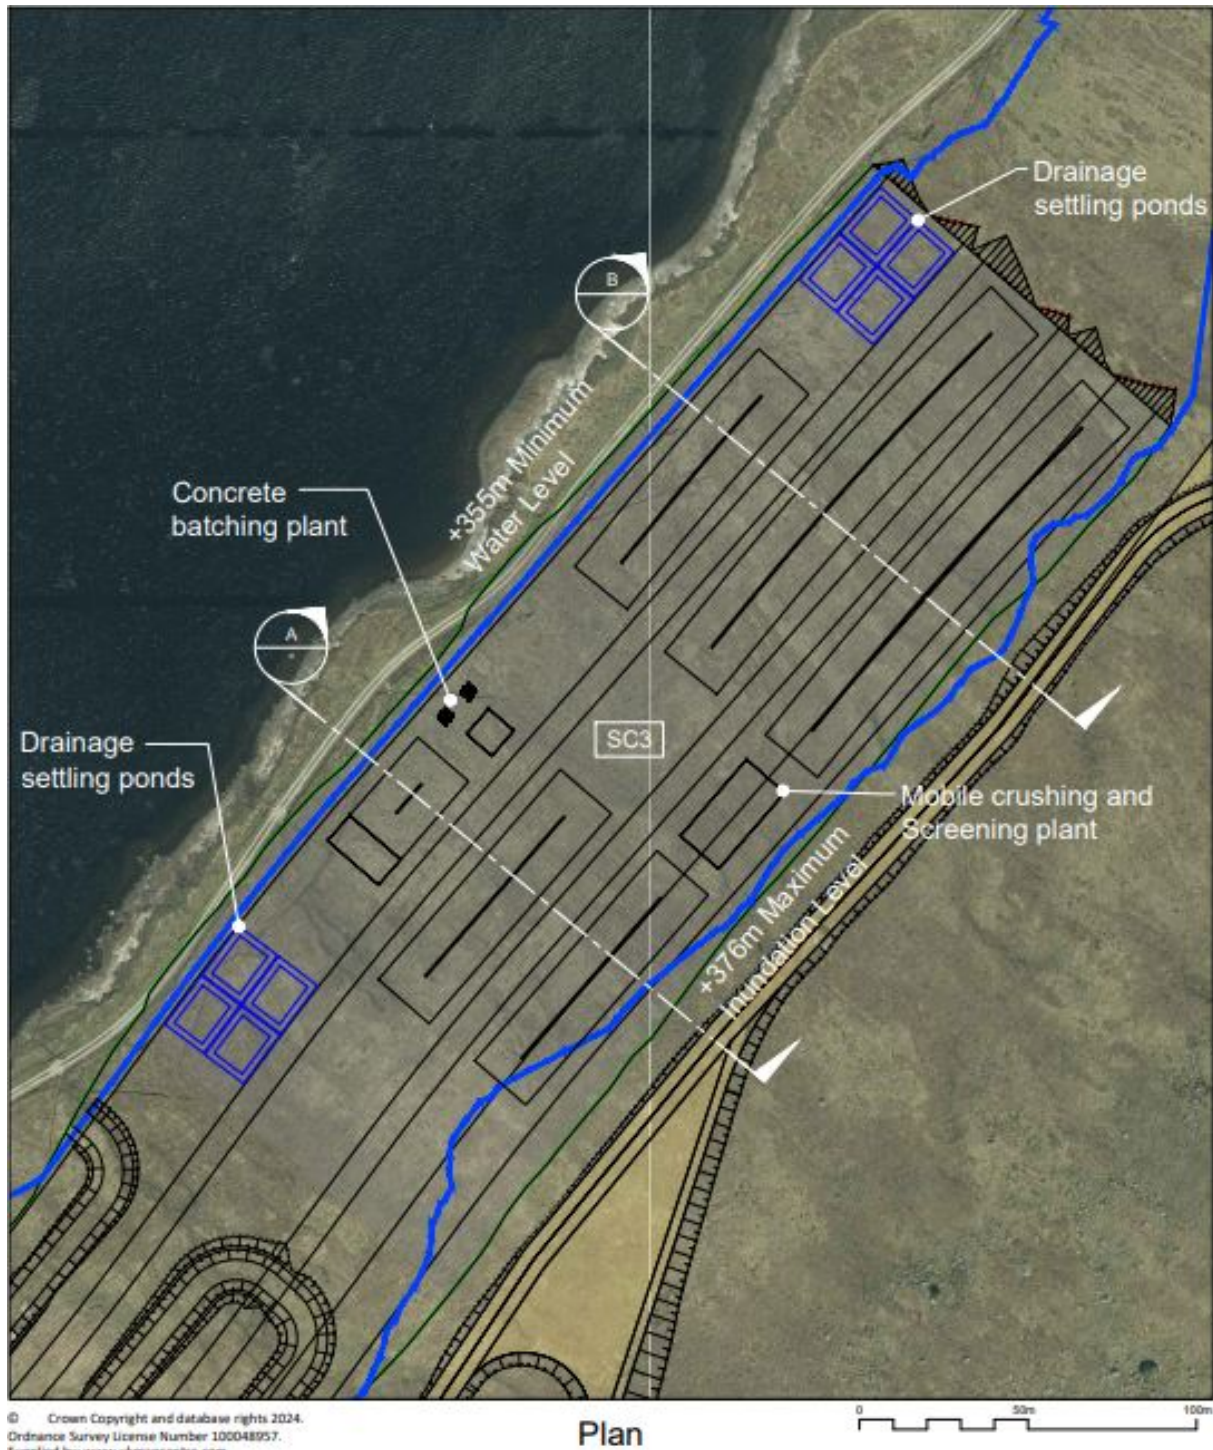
Plan of Site Compound 3 at Powerhouse Area
